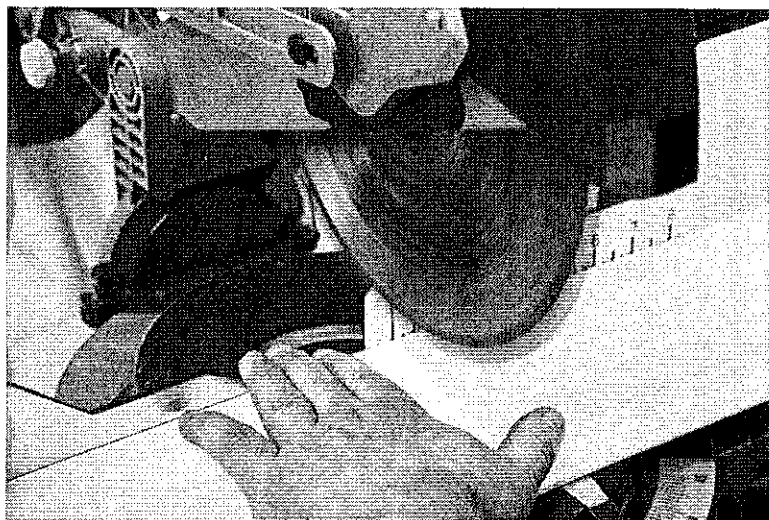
When using power tools, such as a miter saw, be sure to keep your hands clear of any moving parts and blades to avoid accidents.
